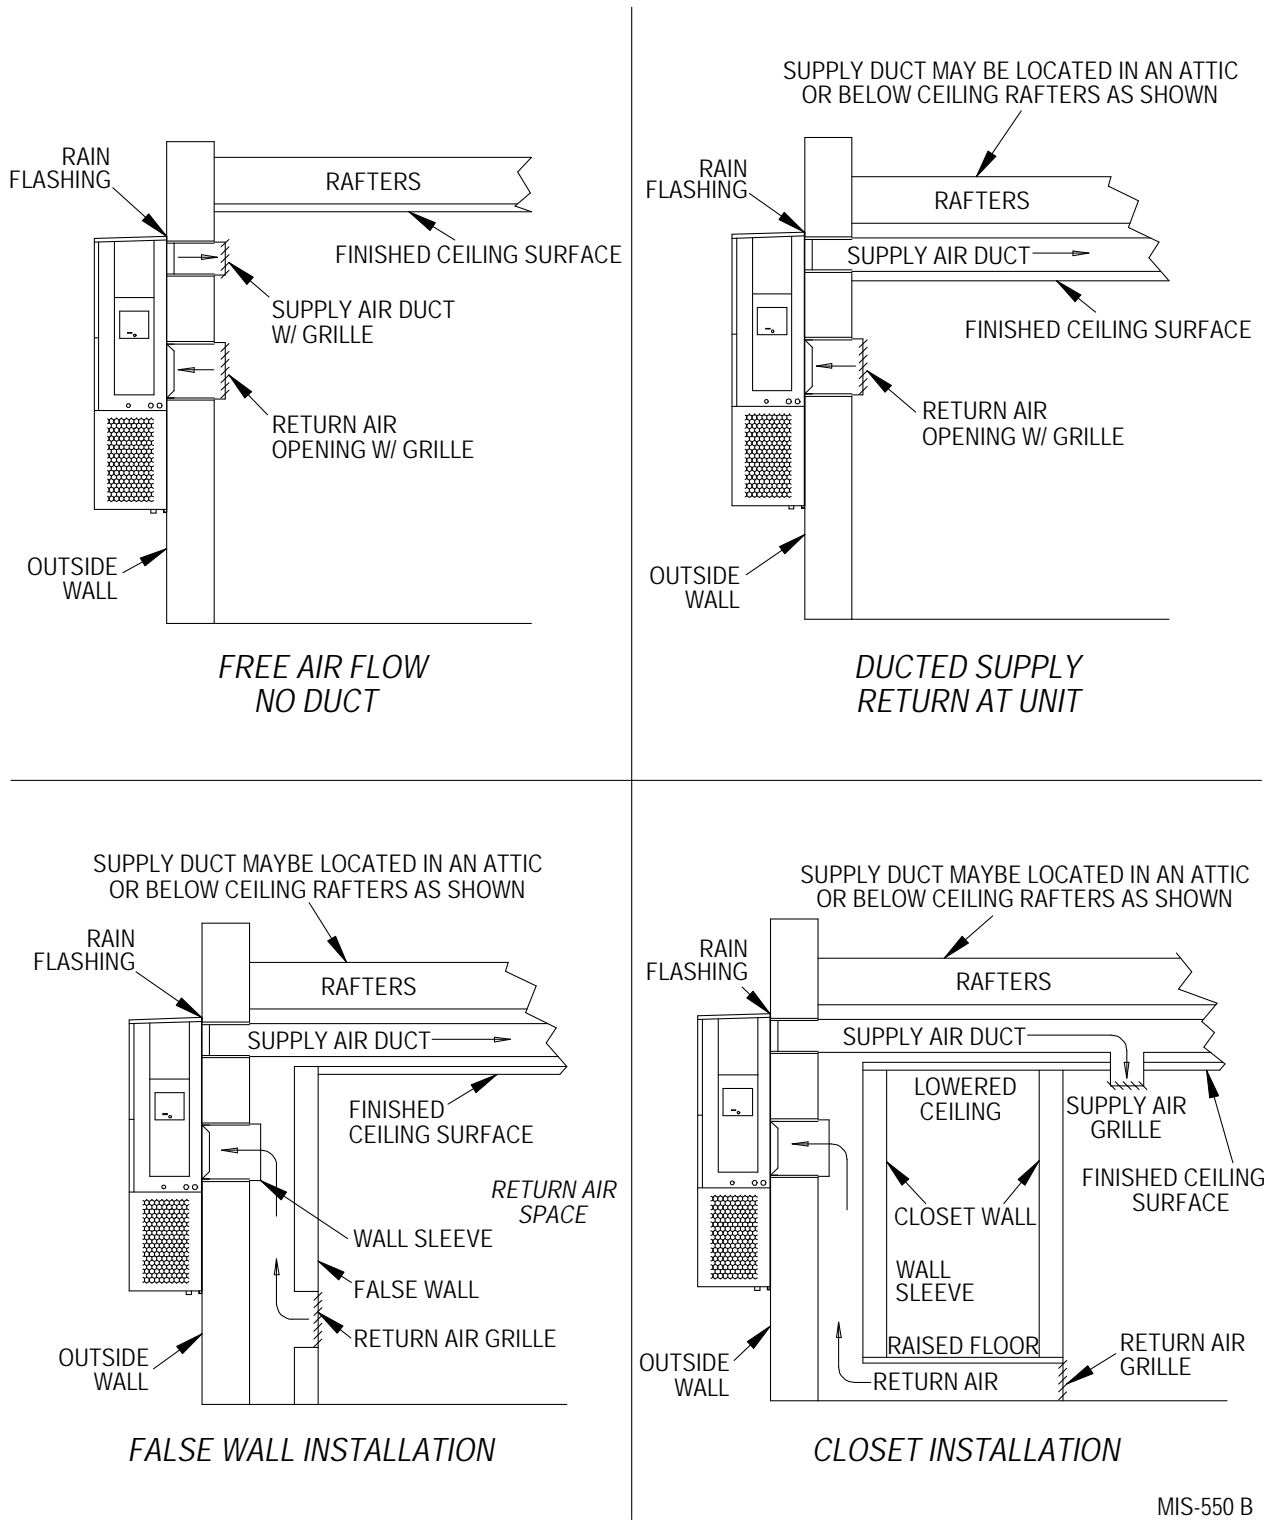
WALL MOUNTING INSTRUCTIONS
